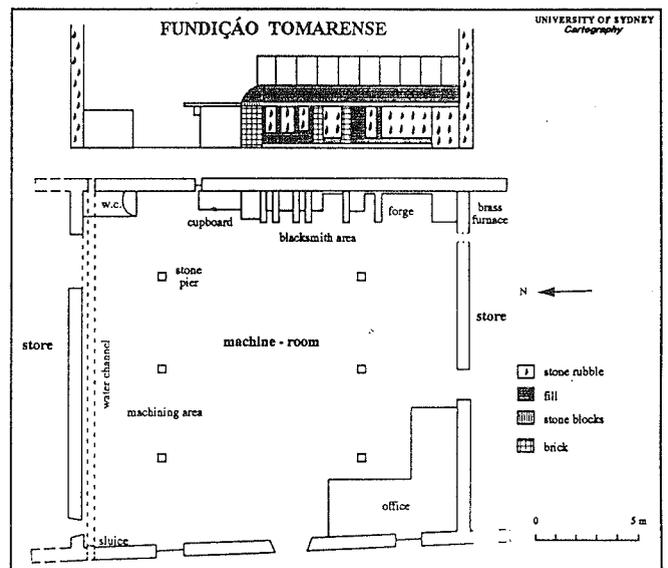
Plan of the machine room in the Tomar Foundry, formerly the *lagar do Secretario*. The remains of the stone housing for the olive-pressing beams are on the eastern wall, north of the later forge. An elevation of the eastern wall is shown above.
